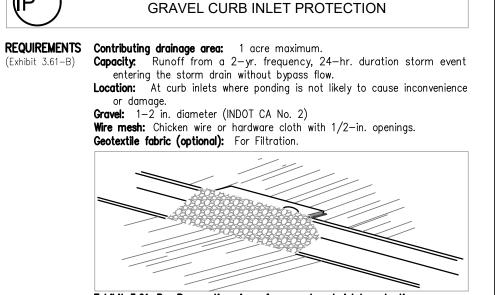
B. Perspective view of a gravel curb inlet protection. INSTALLATION 1. Install gravel curb inlet protections as soon as the streets are paved in (Exhibit 3.61-B) a new development situation or before land-disturbing activities in
